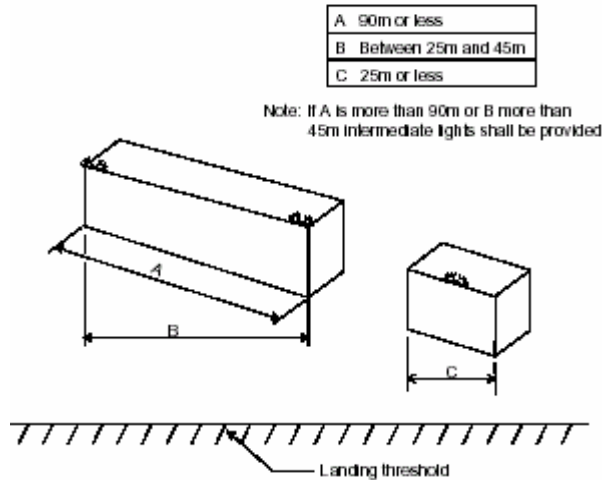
Typical lighting of horizontally extended obstructions
